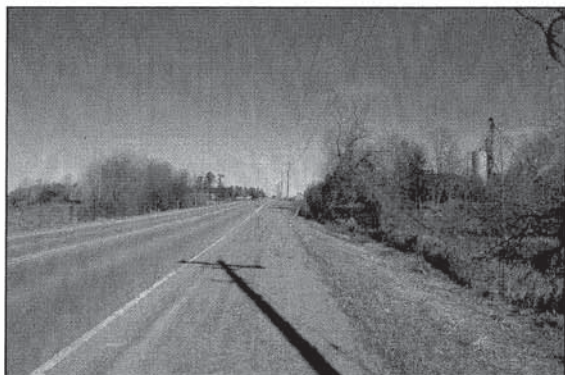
View to the northwest along west side of Mississauga Road at distributed ROW where additional shafts of sewer installations are to occur
